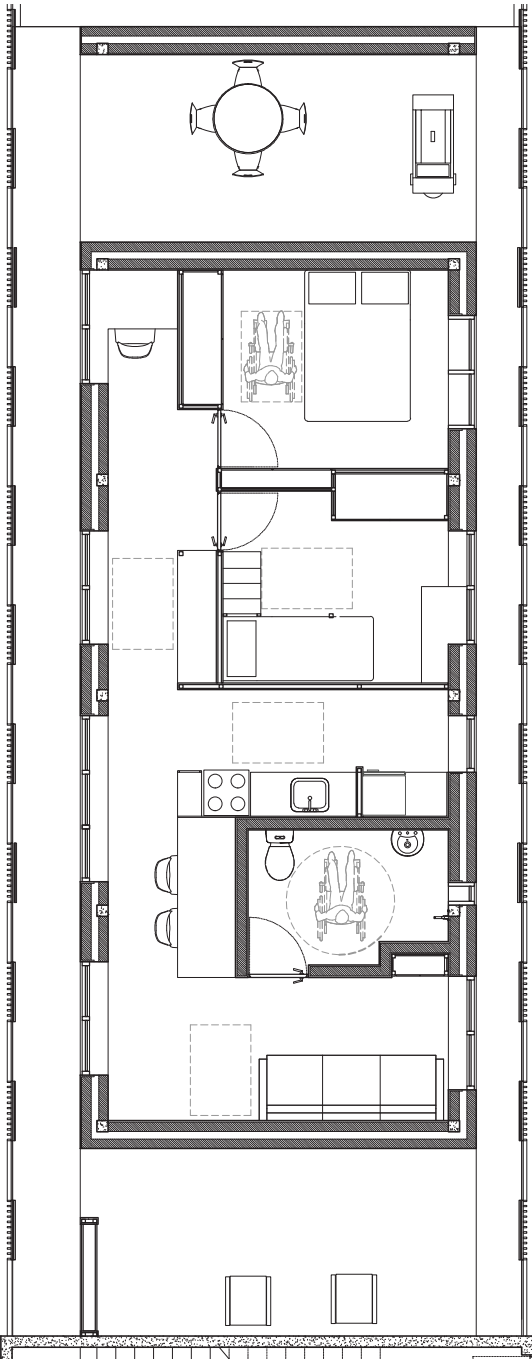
Plan of the accessible N apartment, scale 1:100.
